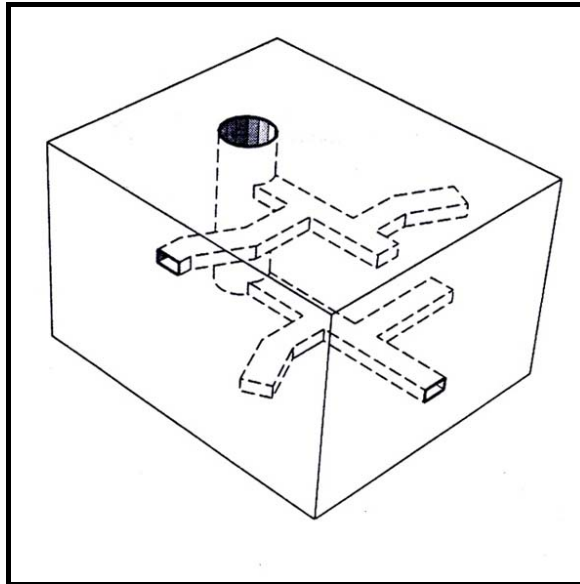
Shafts and Tunnels in Underground Mining (Source: Sterling, 1993).
